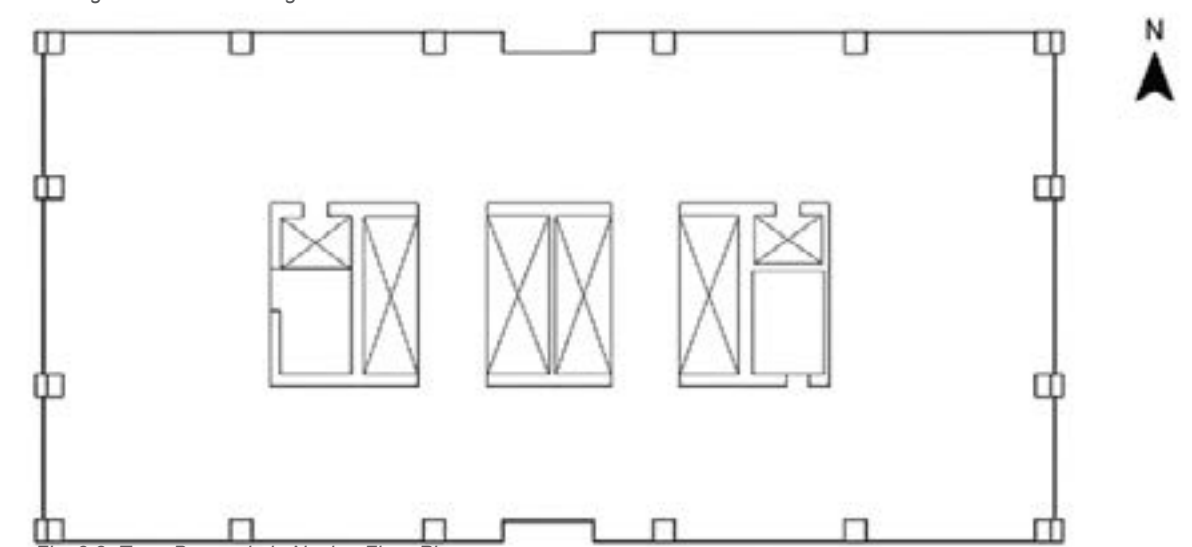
Torre Banco de la Nacion Floor Plan.
